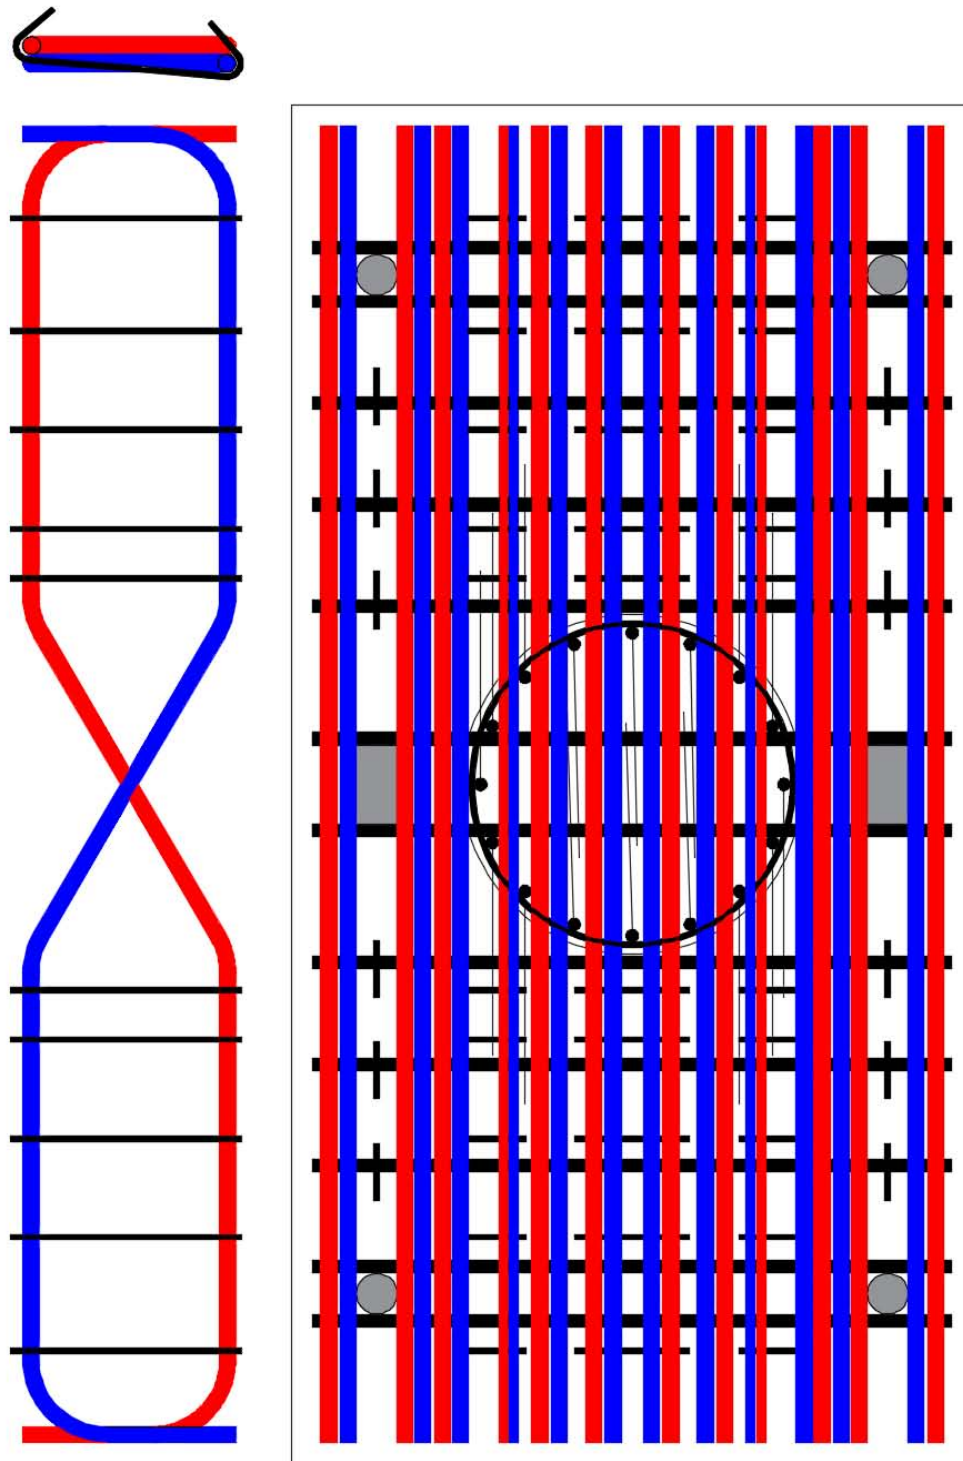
Footing Reinforcement Details for 24" Diameter Specimens
